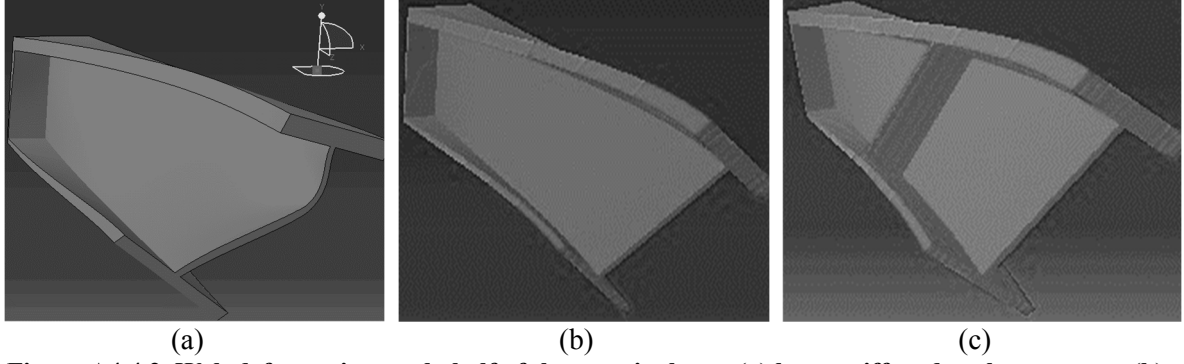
Web deformation –only half of the span is shown (a) beam stiffened at the supports, (b) beam stiffened at both ends and mid-span (mid-span stiffeners not shown for clarity) and (3) beam stiffened with five stiffeners (mid-span stiffeners not shown for clarity)
